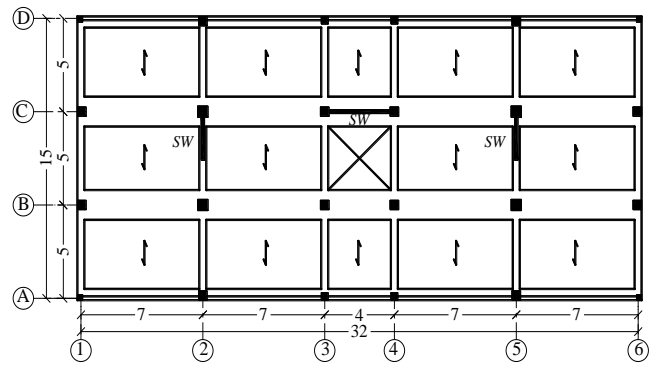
Plan of the retrofitting system: shear wall (SW)
